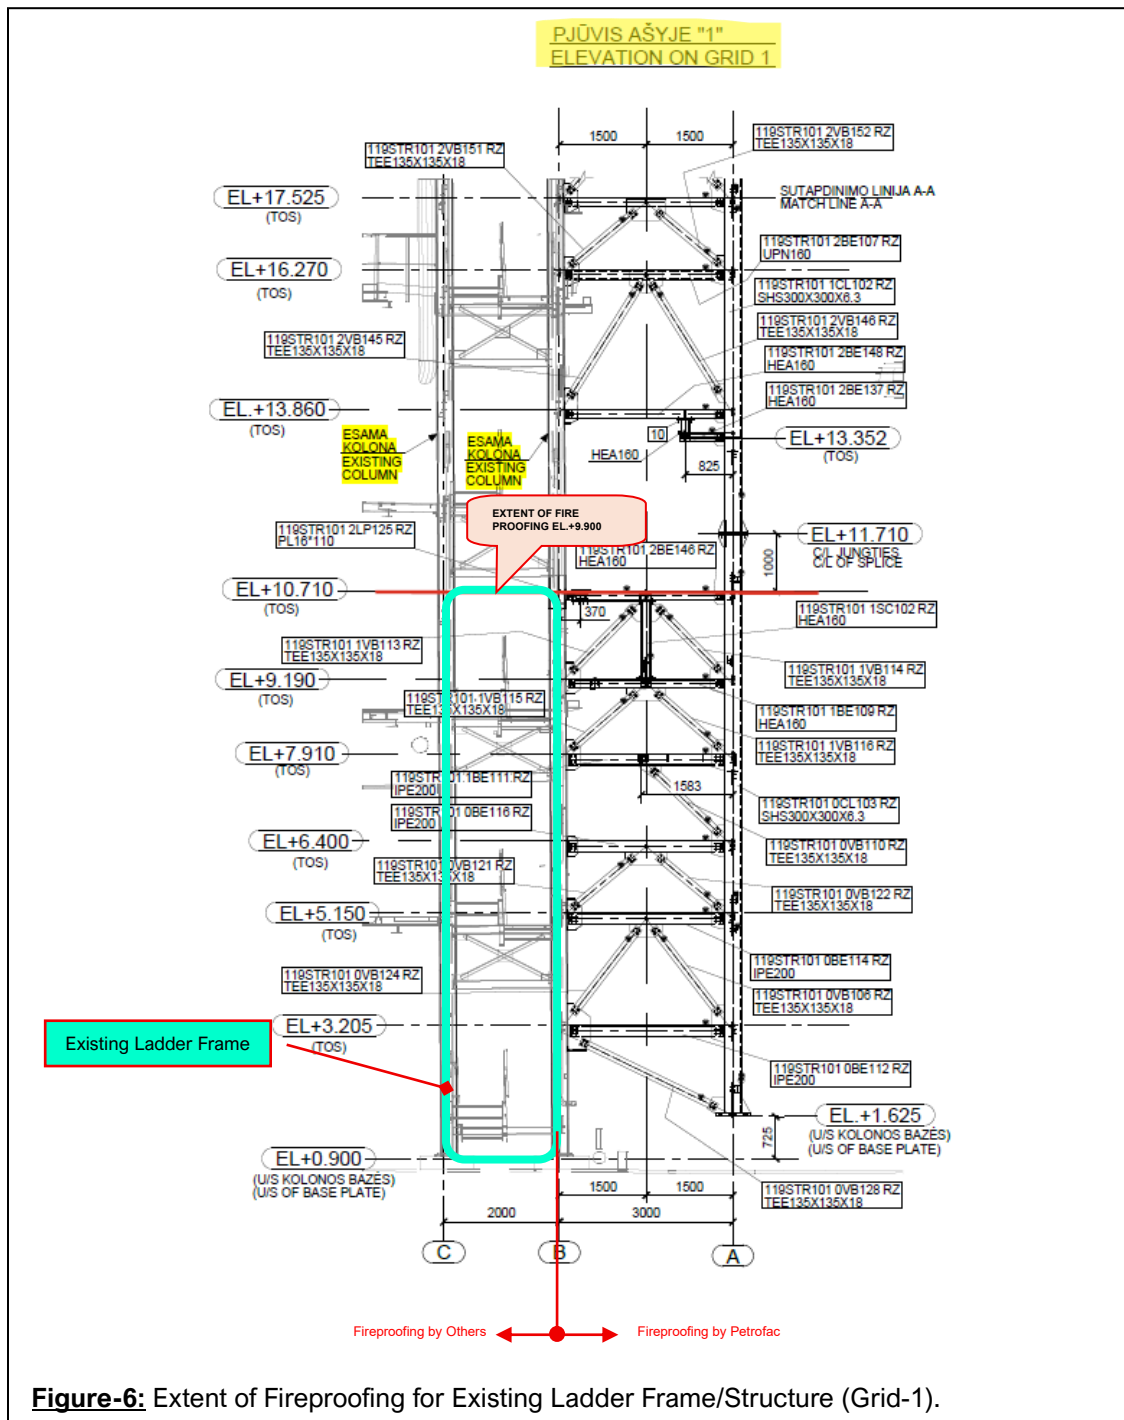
Extent of Fireproofing for Existing Ladder Frame/Structure (Grid-1).
